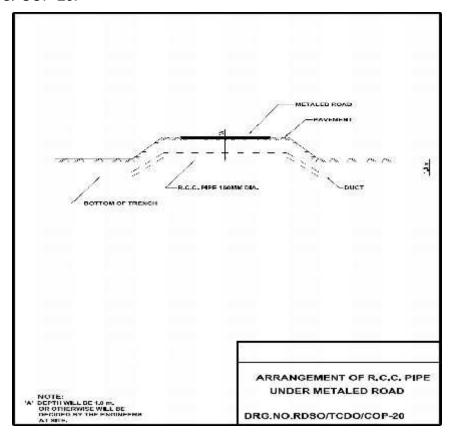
Arrangement of RCC pipe under metalled road is shown below as per drawing no. RDSO/TCDO/ COP-20
